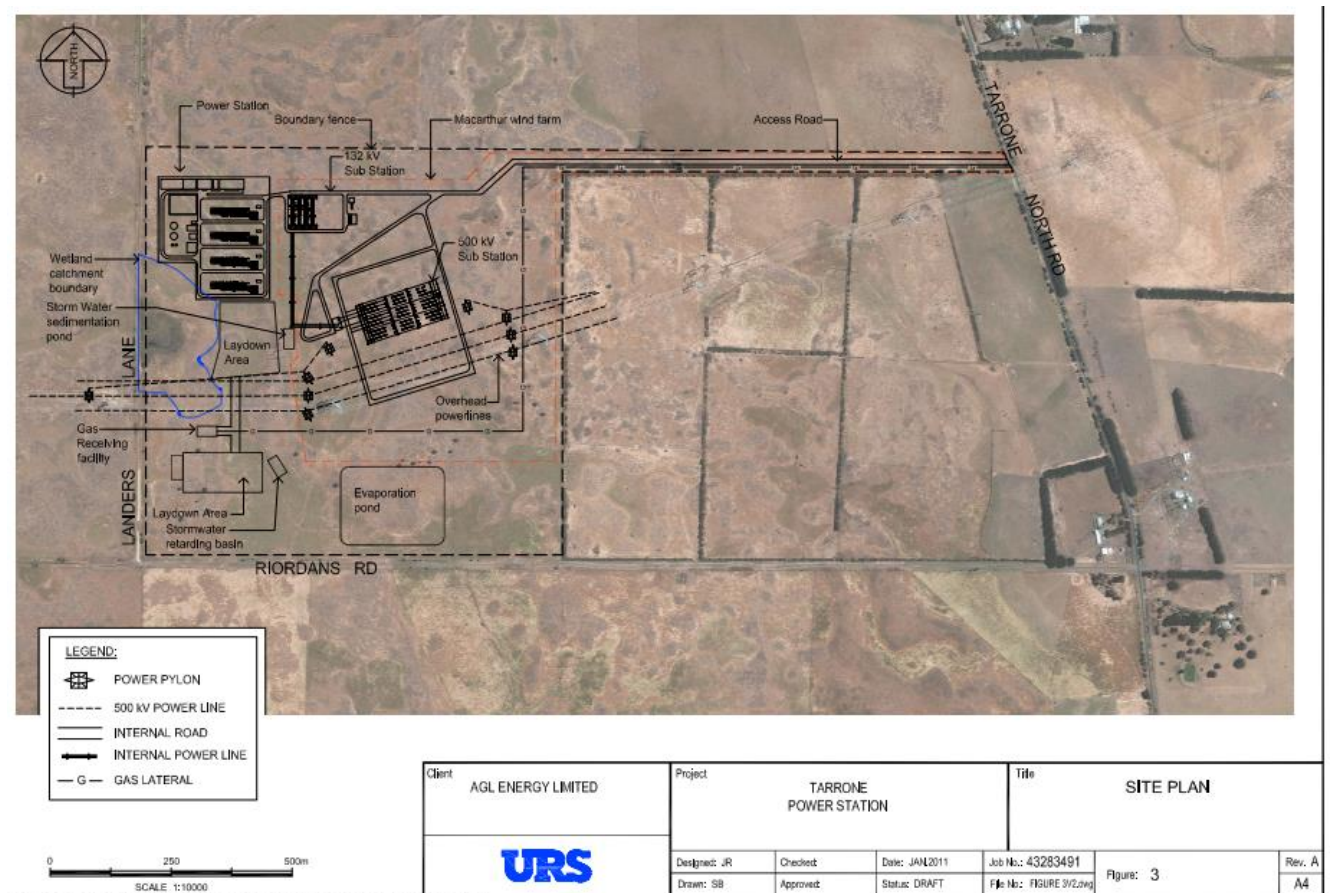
Tarrone Gas-Fired Power Station (Source: URS Site Plan Drawing No. FIGURE3V2.dwg Rev A Jan 2011)
